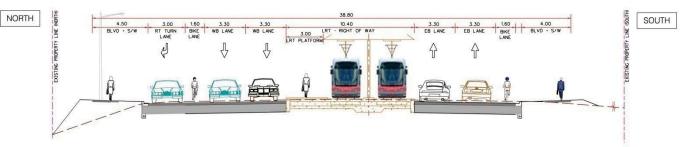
Typical Cross Section for a Right Turn Lane at Rerouted Left Intersections
